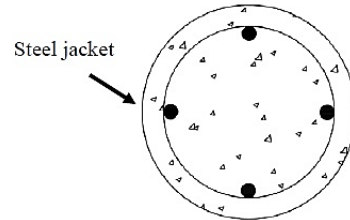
Standard steel jacket on circular reinforced concrete columns (Li et al., 2005).
